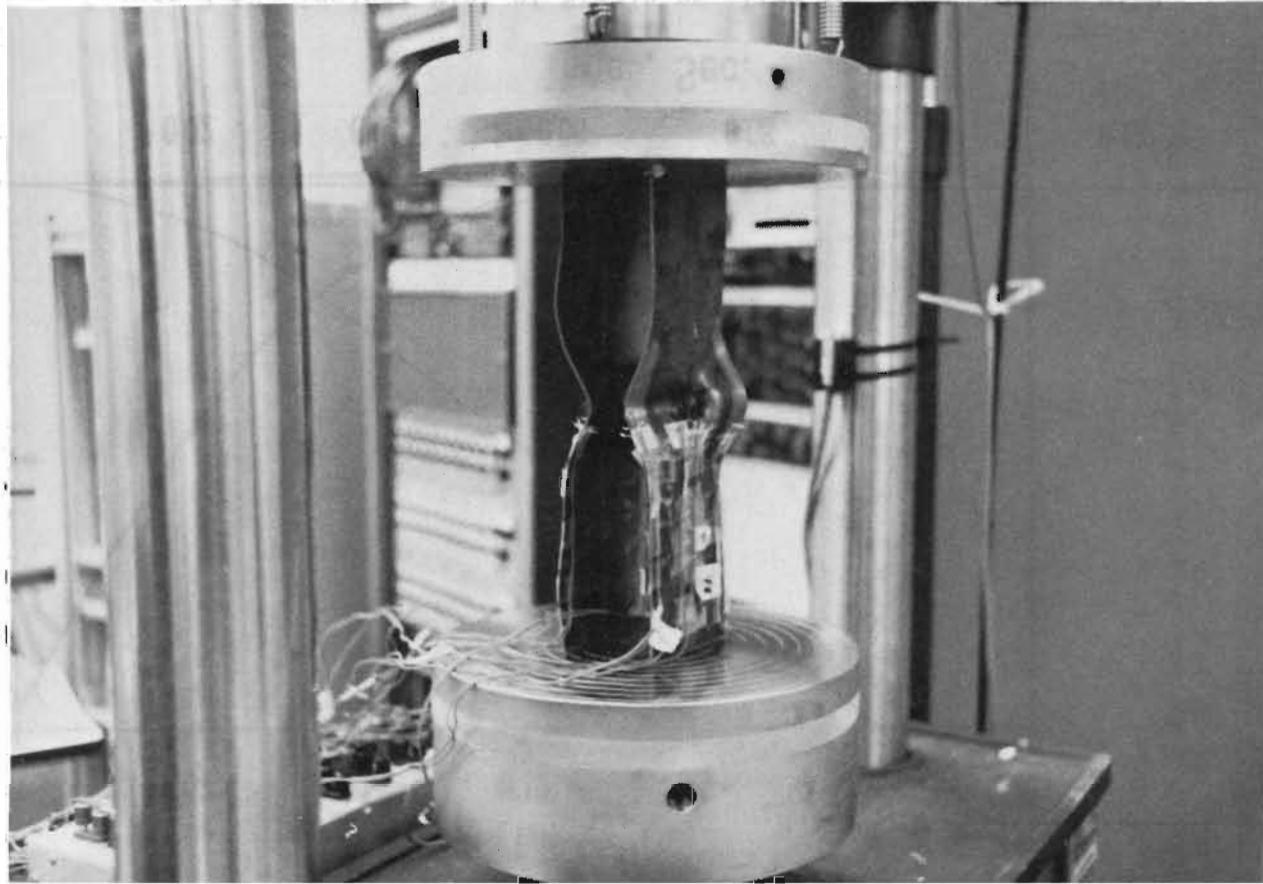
Typical Failure of Stub Columns with Unstiffened Flanges
